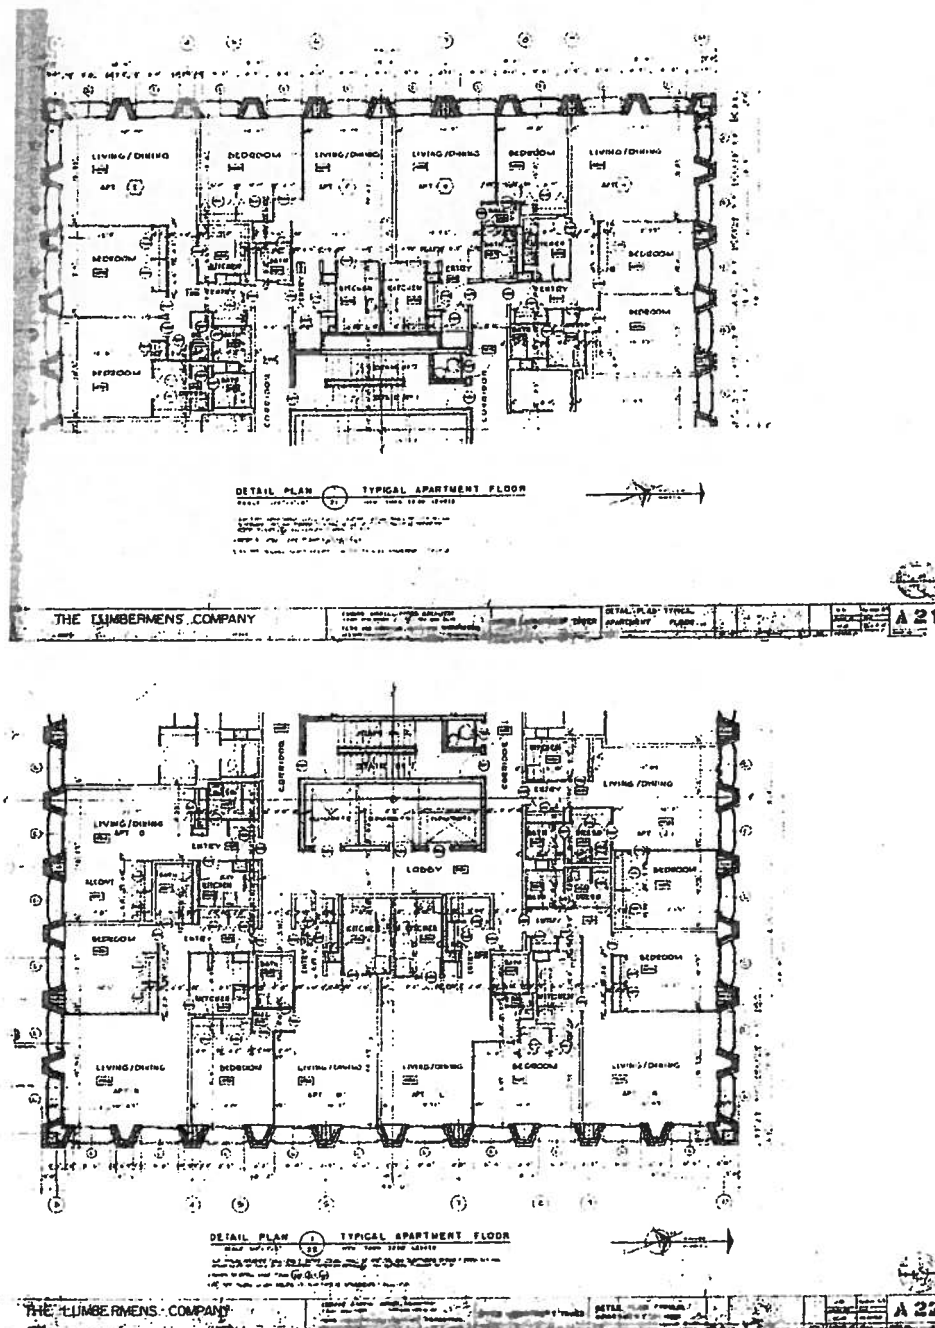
Detail plans for typical apartment floors, levels 11-22.
